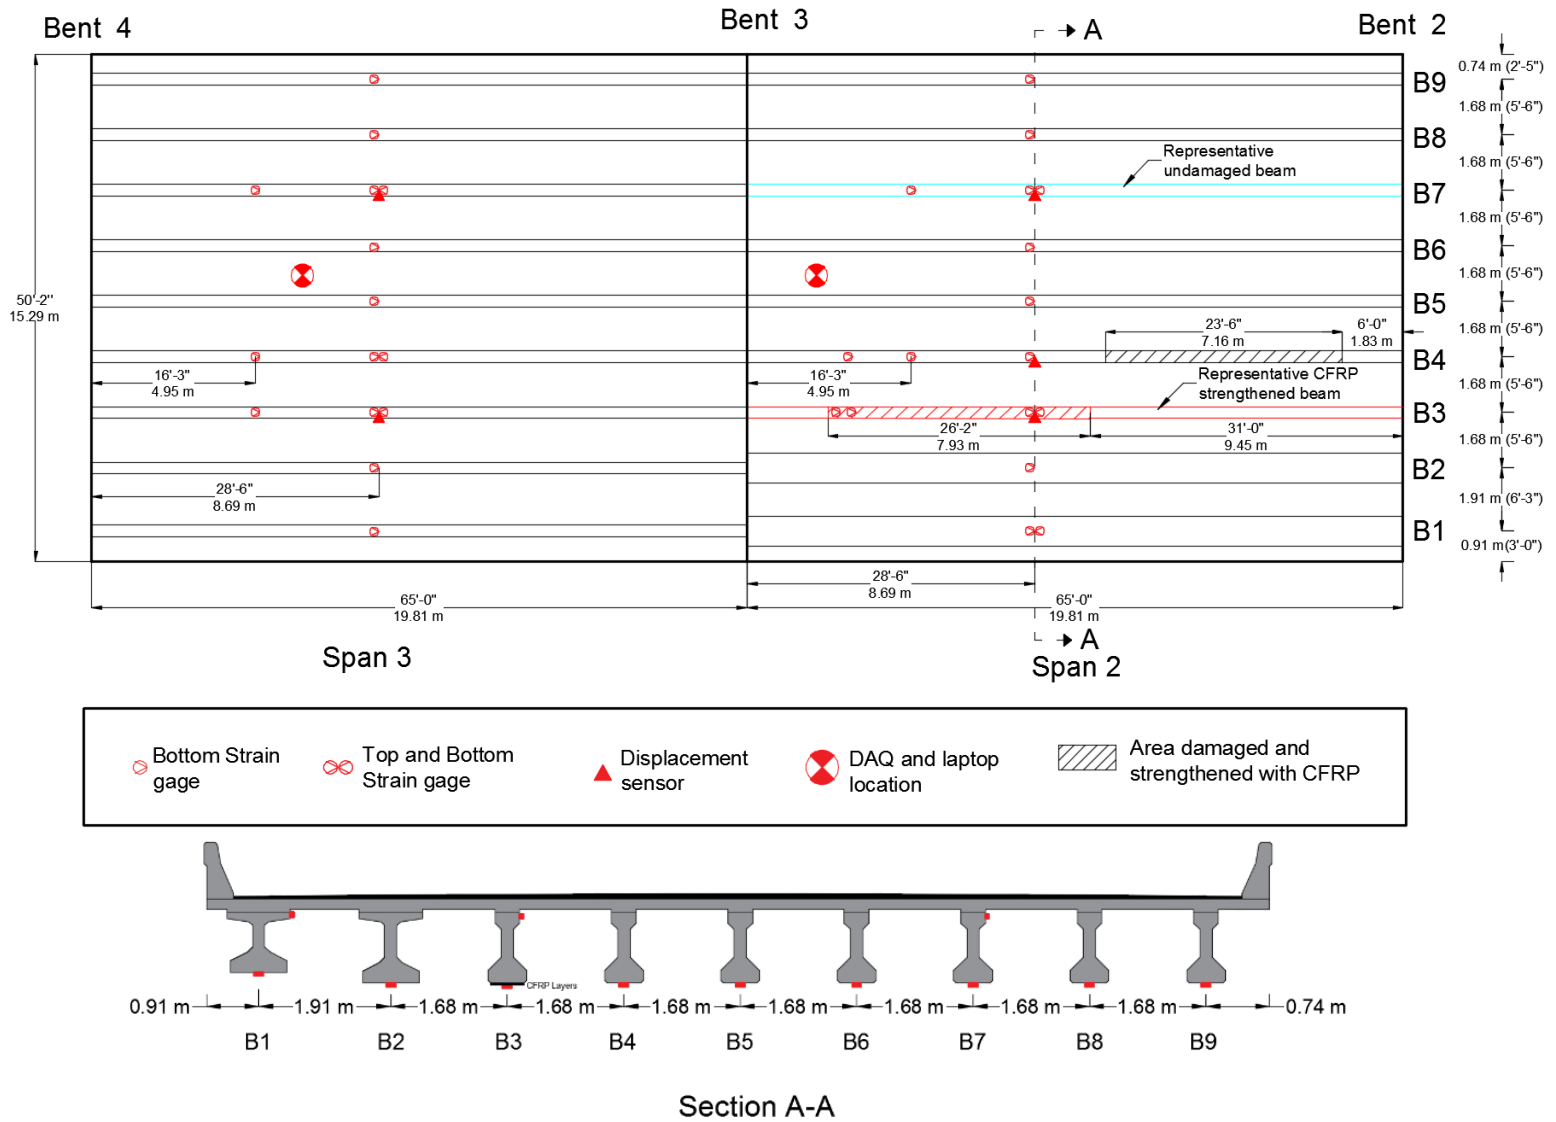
Instrumentation plan for Loop 12 Bridge
